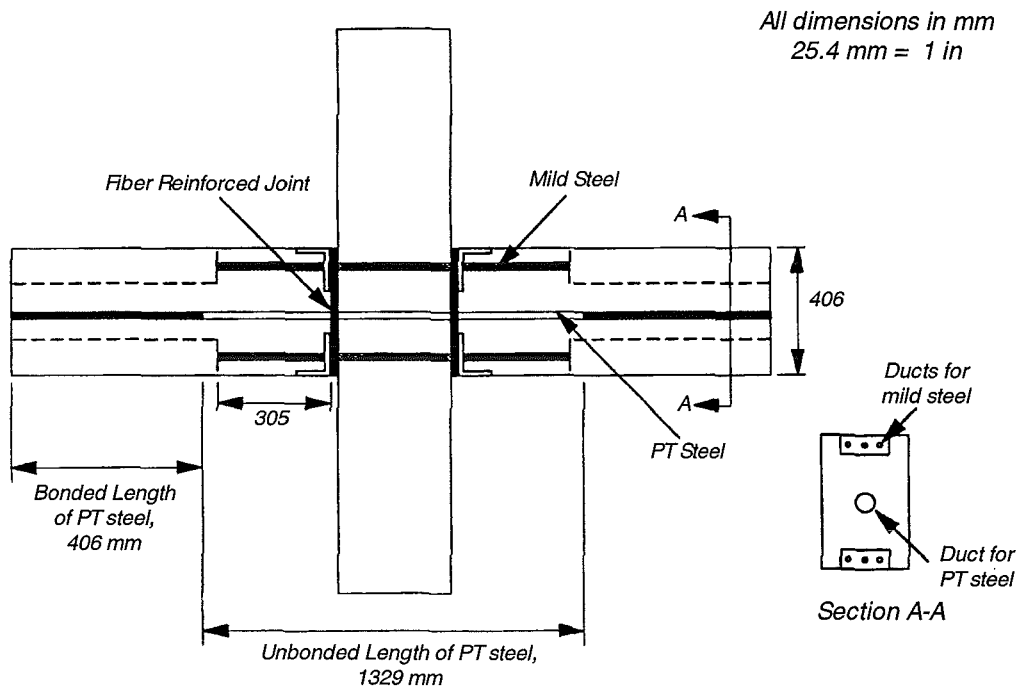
Hybrid precast concrete connection for frame systems [S4].
